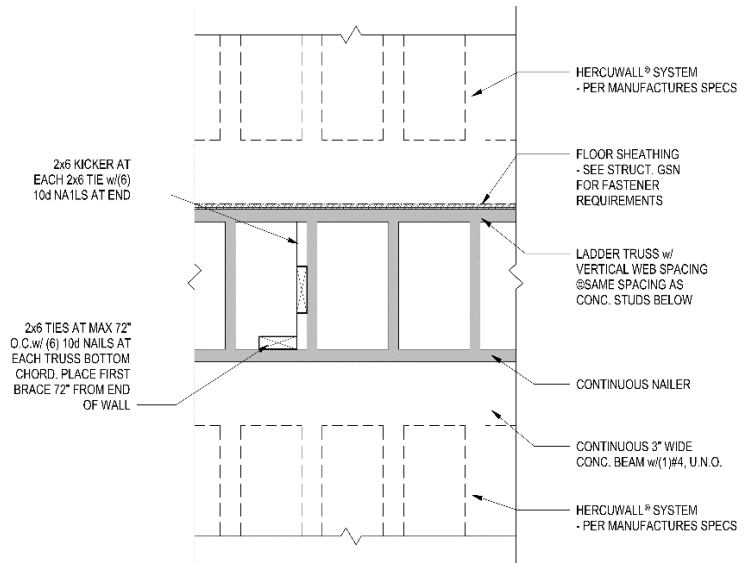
Typical Truss Parallel to Wall (Elevation)
